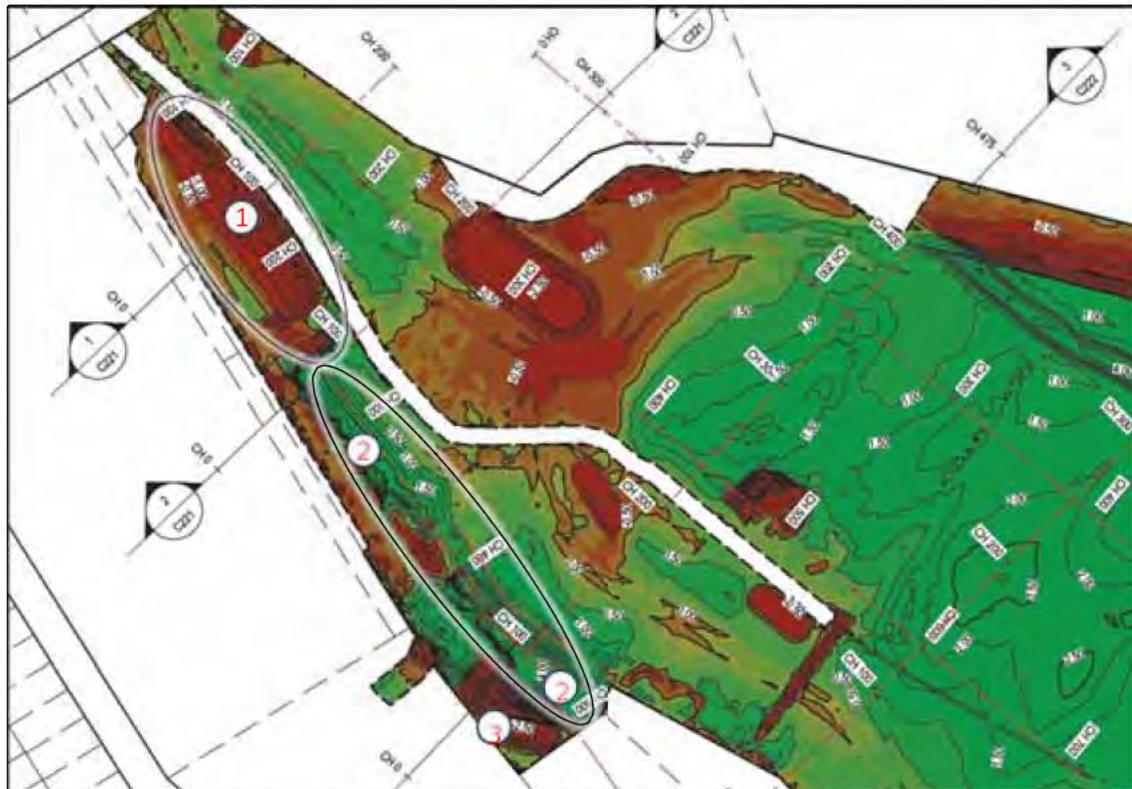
Excerpt from proposed / conceptual earthworks plan (refer Section 2 for details)
